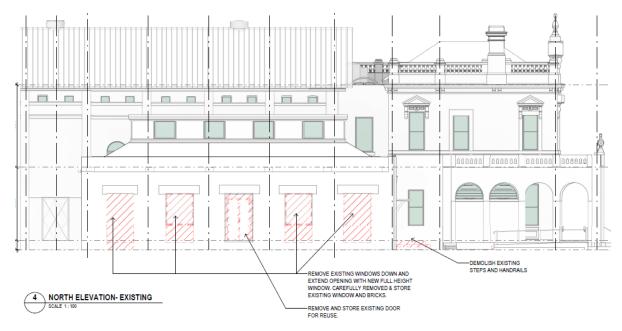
Northern elevation existing (Source: Architectural Drawing No. AR-DA1-2000, Rev C)
